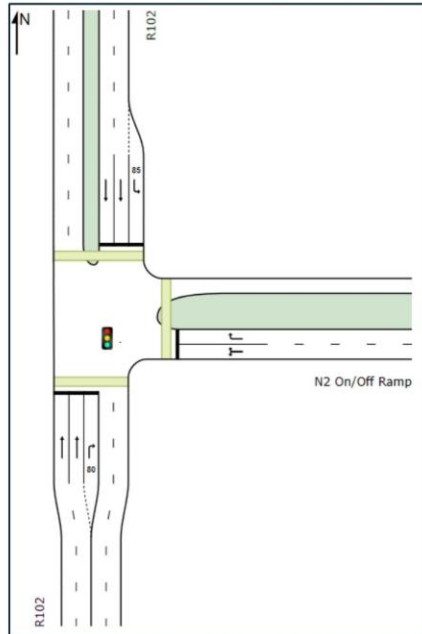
R102 and National Route 2 Northbound Carriageway Ramp Terminal Proposed Intersection
